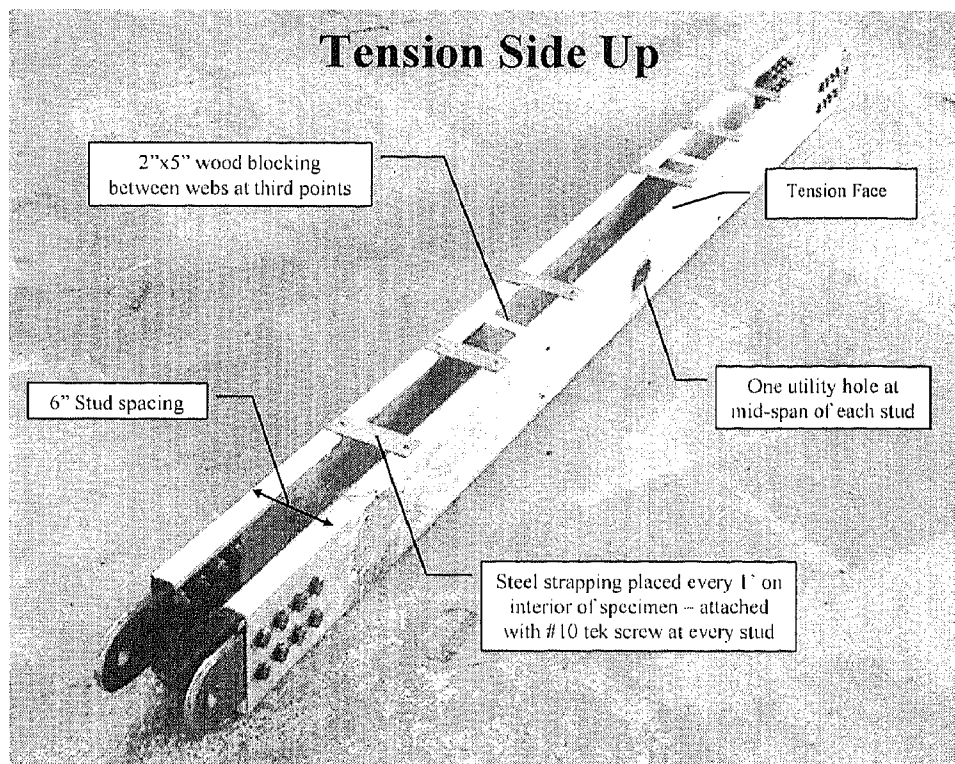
Fully Constructed Steel Hinge Test Specimen (Tension Face)
